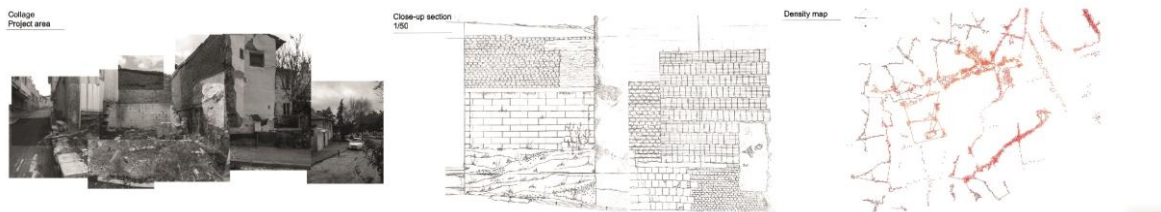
Site collage, site survey drawings and mapping on the site. Student: Dilay Yücaltı
